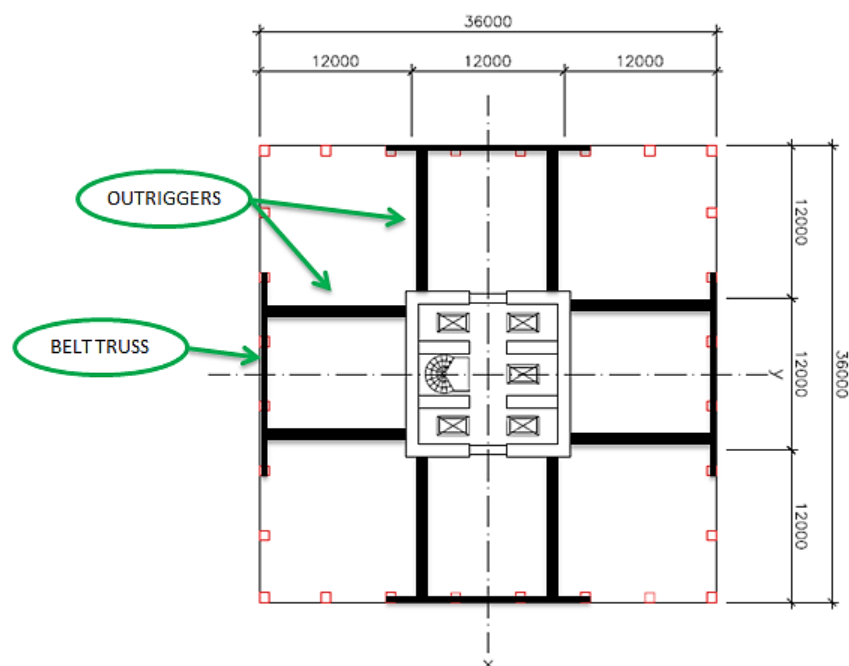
Principle layout of the outrigger floor. Outriggers are stretching between the core and the façade and belt trusses stretches along the façade to activate several columns.
